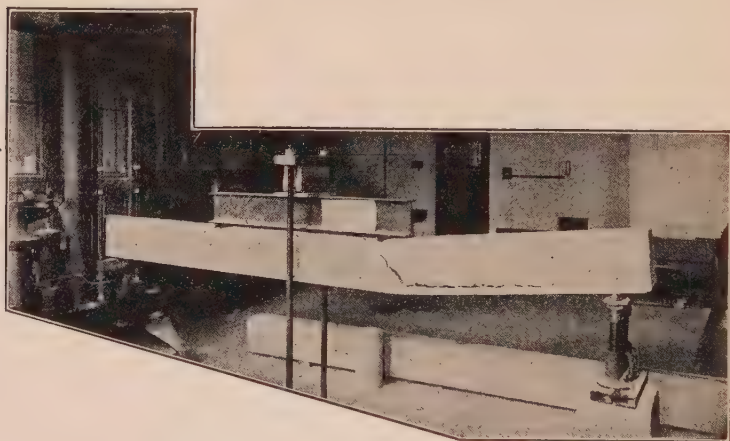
Failure of a reinforced-concrete beam.
